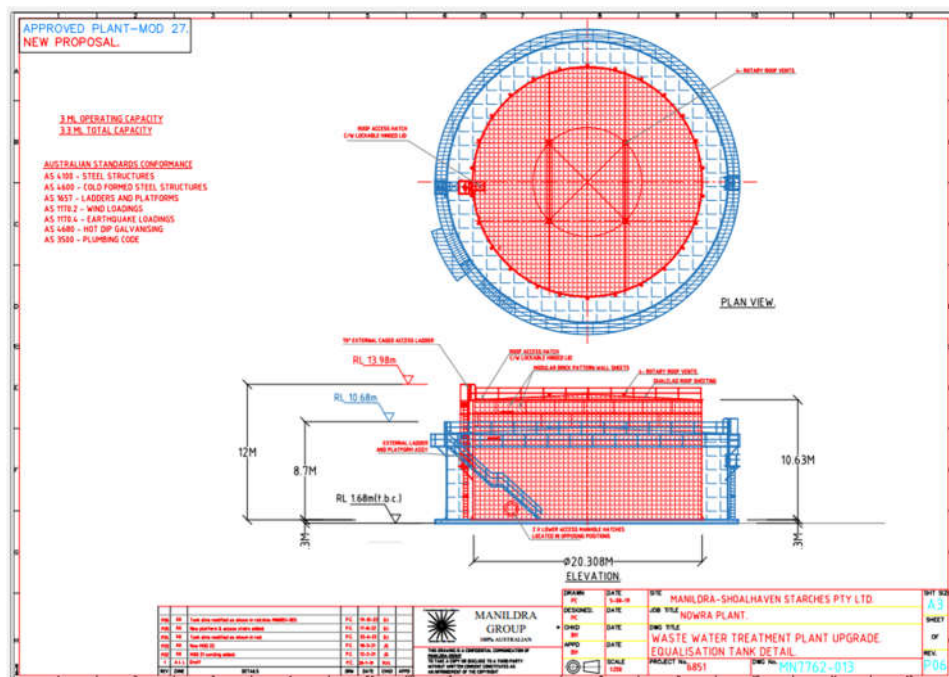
Plan and elevation details proposed Equalisation Tanks
